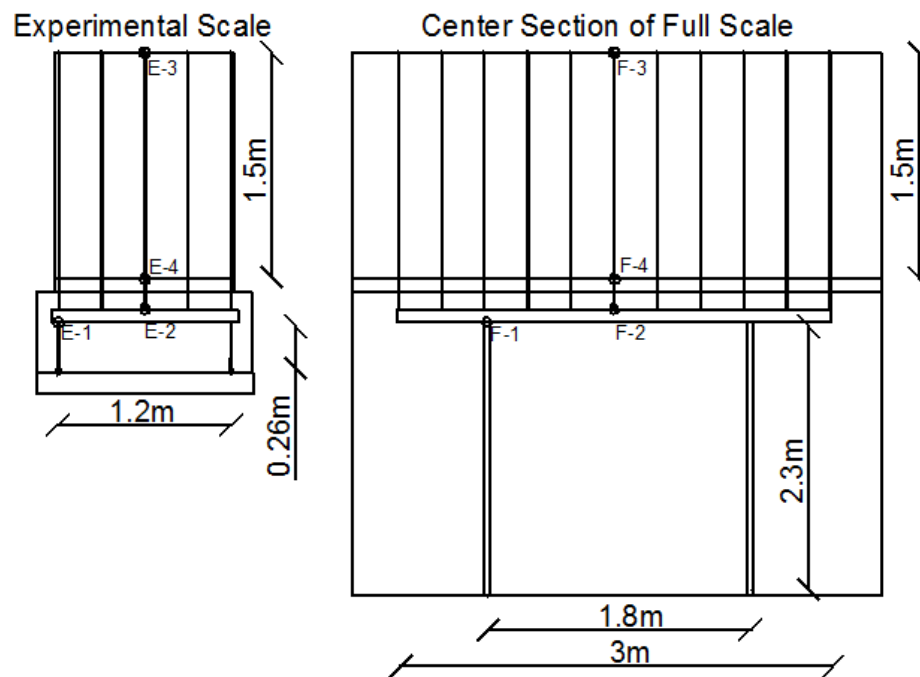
Elevation view of Experimental and Full-Scale Systems
